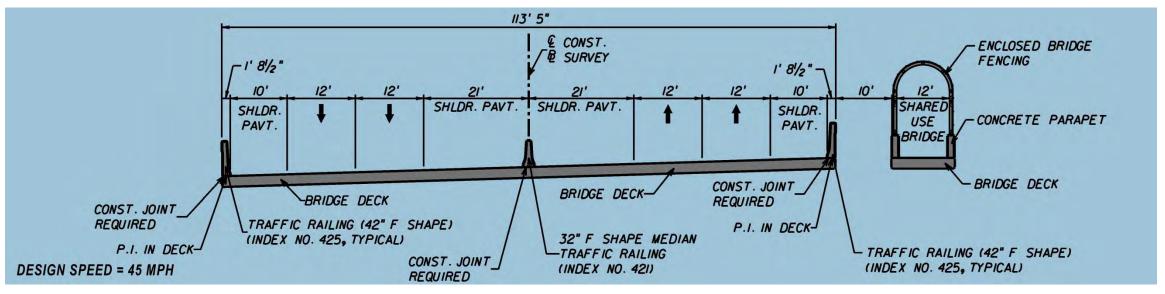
Typical Section of Bridge Crossing with a Separate Pedestrian Bridge
